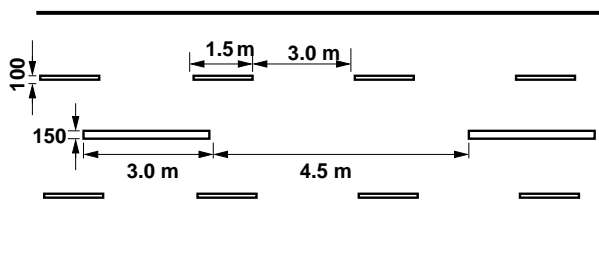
6: Traffic lane marking for a four lane road with broken centre line
